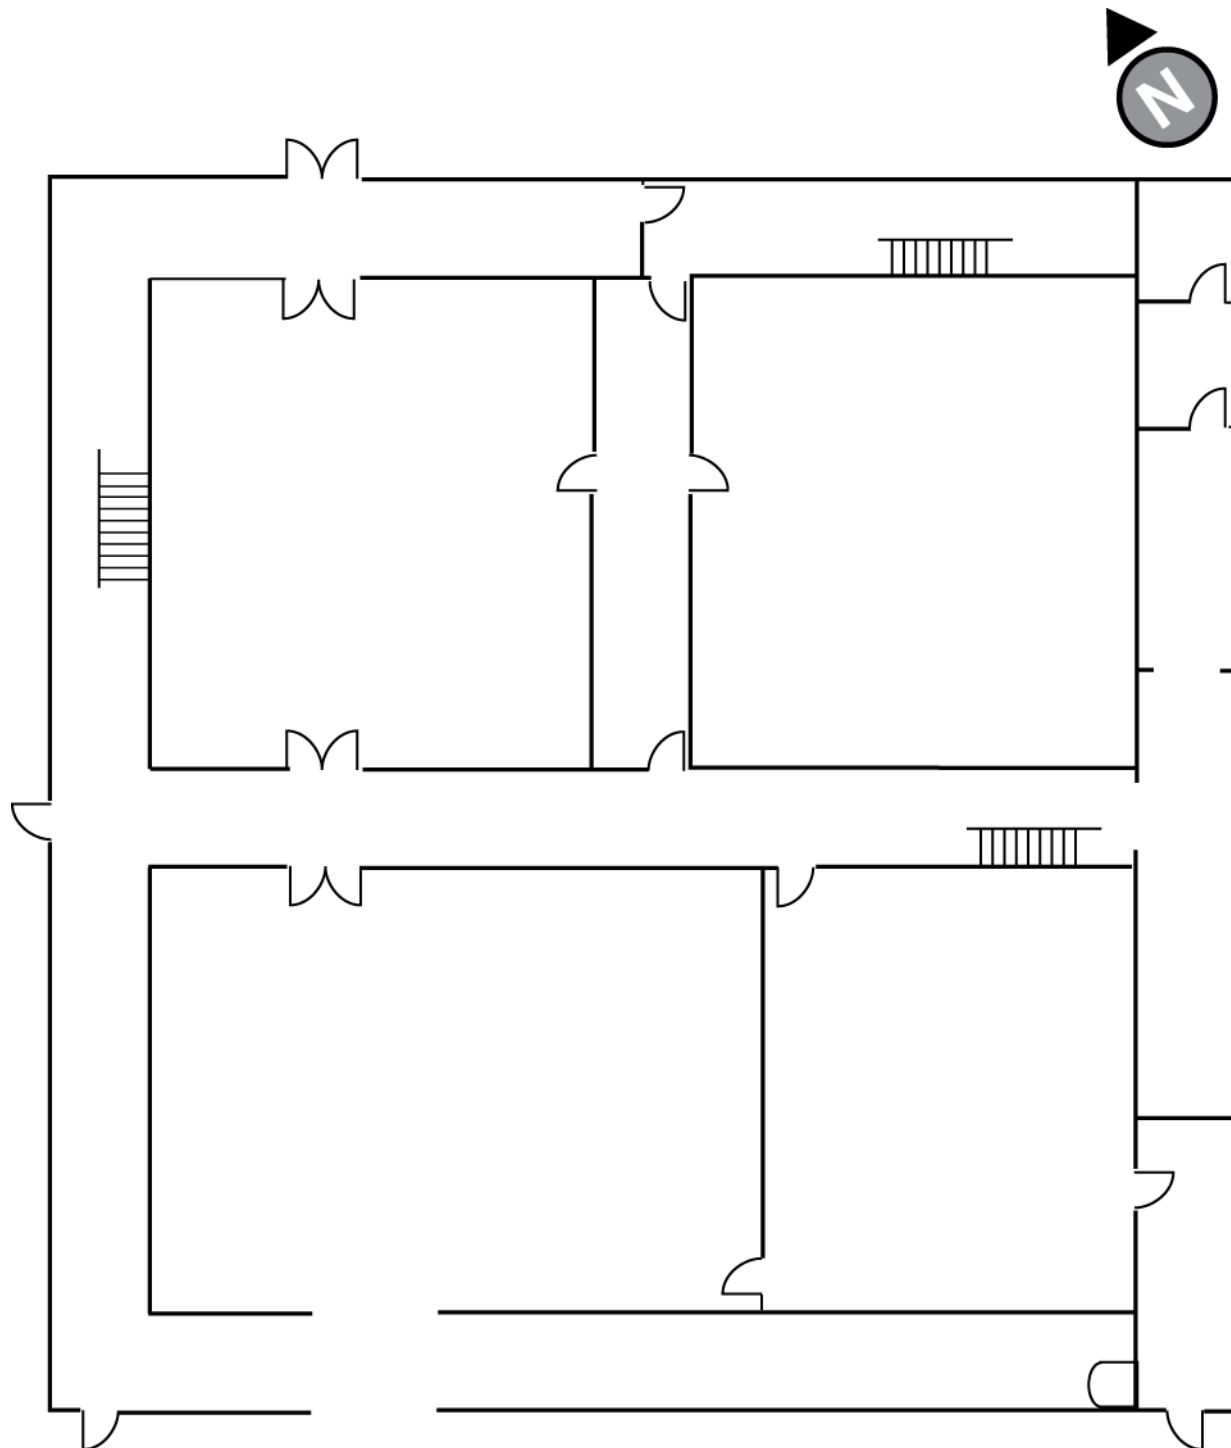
Floor Plan for Building H, Special Projects Building, 1st Floor
